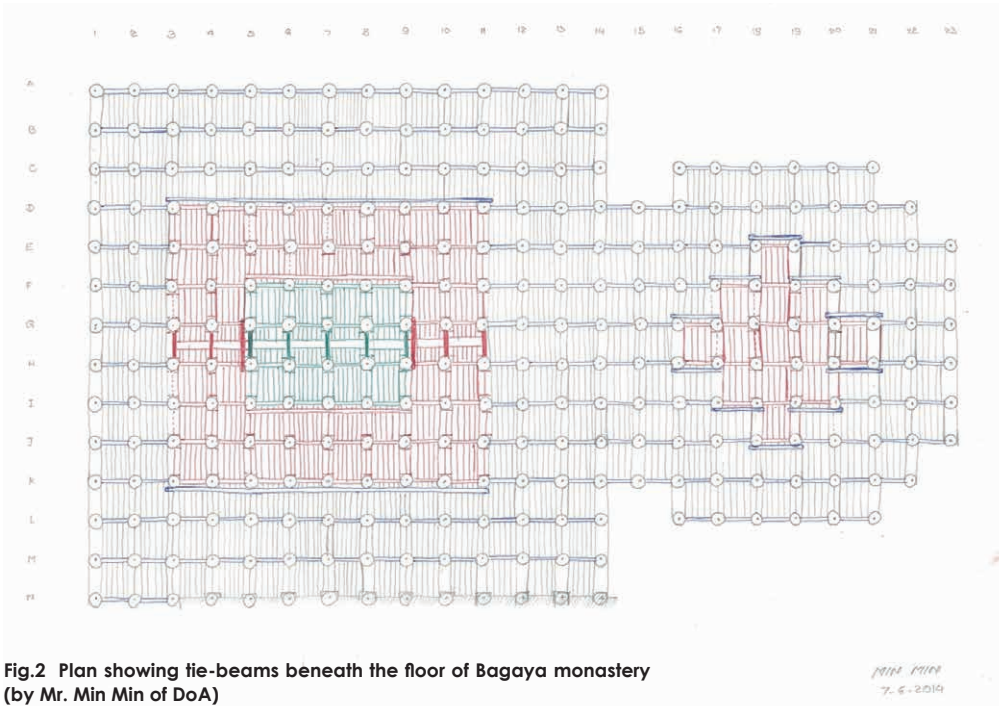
Plan showing tie-beams beneath the floor of Bagaya monastery (by Mr. Min Min of DoA)
